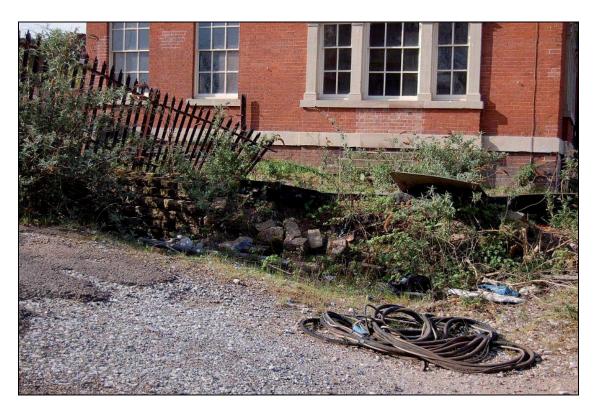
Stone retaining wall to east of Garden Range, view south-west
